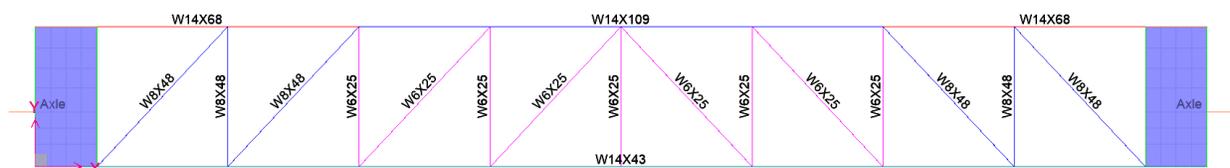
Plan View of Typical Bulkhead Truss
